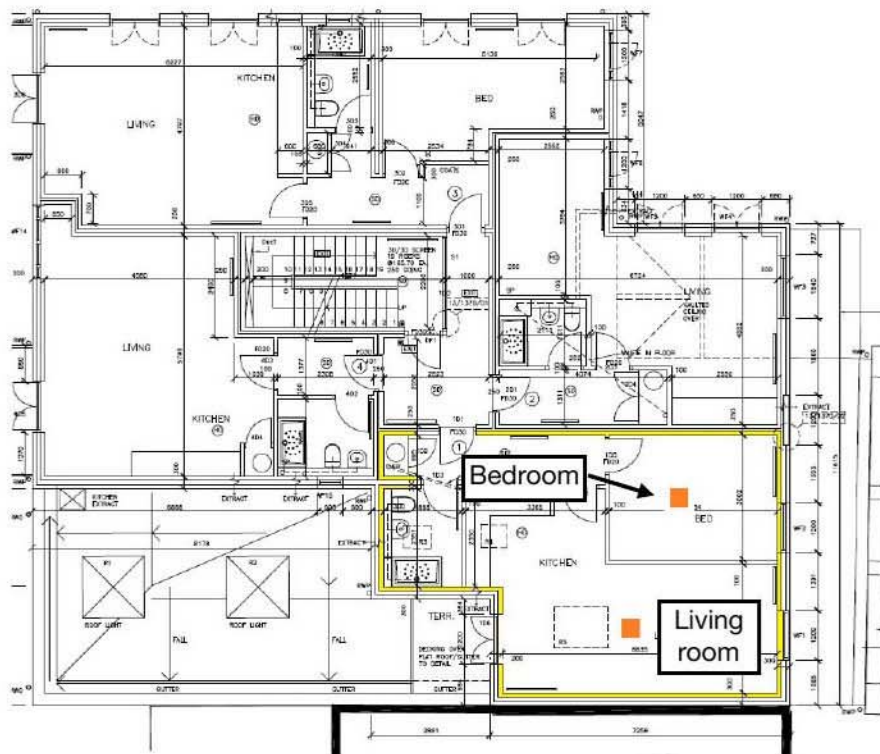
Plan showing first floor layout and flat 1 (receiver rooms) where noise levels were measured in the bedroom and living room
